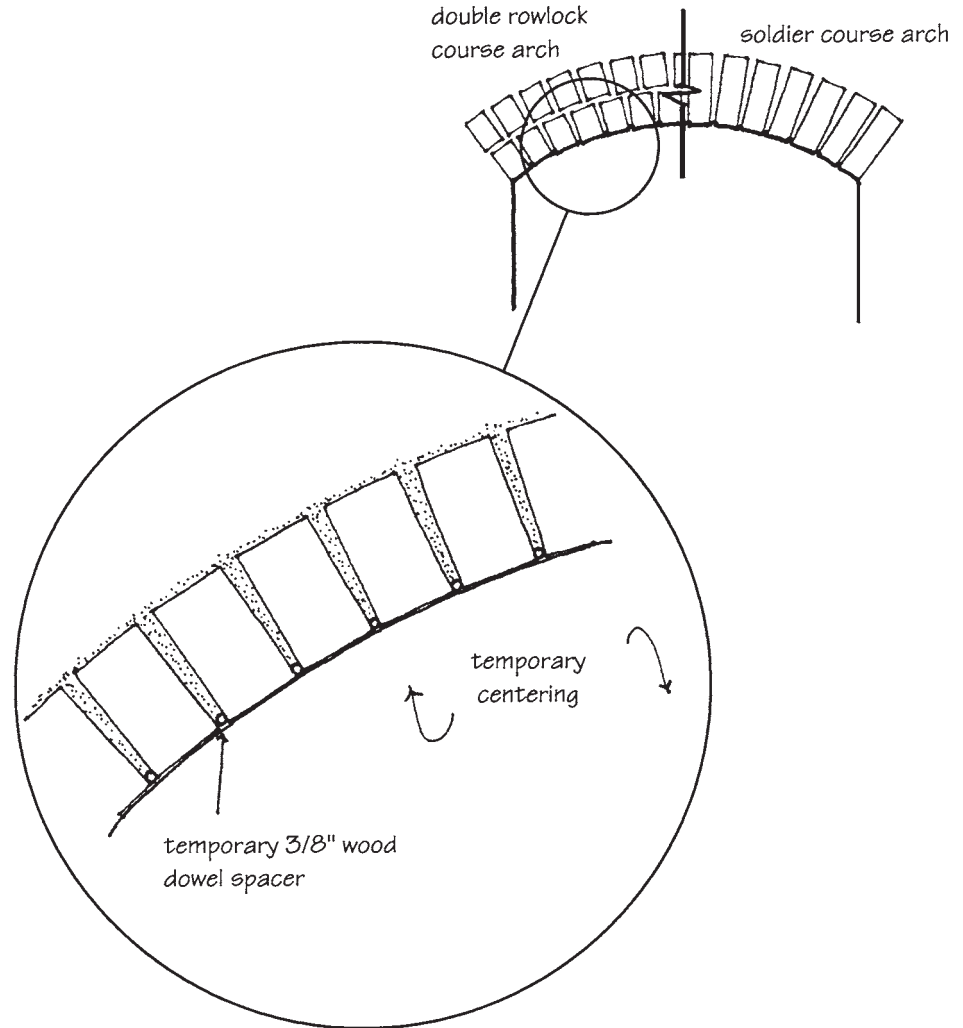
Constructing brick arches. (From Beall, *Masonry and Concrete for Residential Construction*, McGraw-Hill Complete Construction Series, 2001.)
